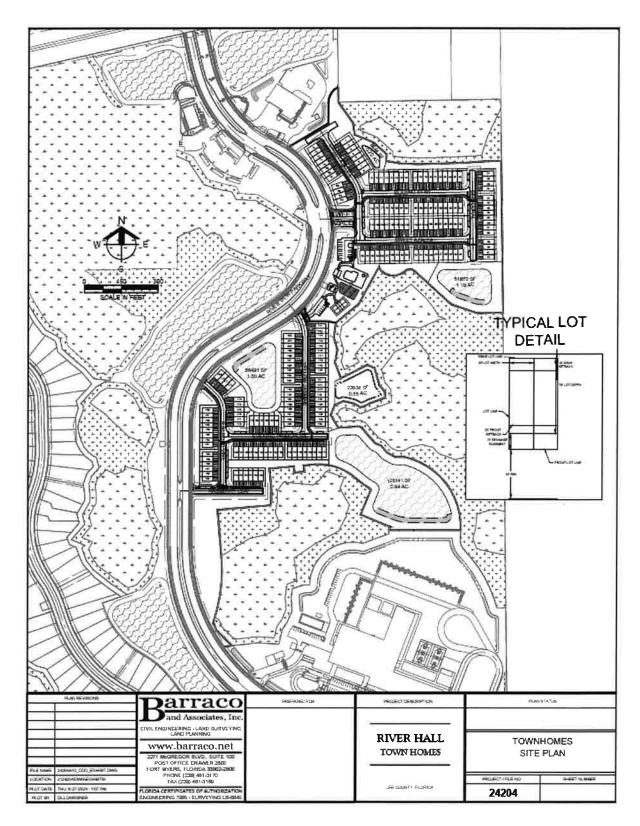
Exhibit D. Townhomes Site Plan (with Typical Lot Detail)
